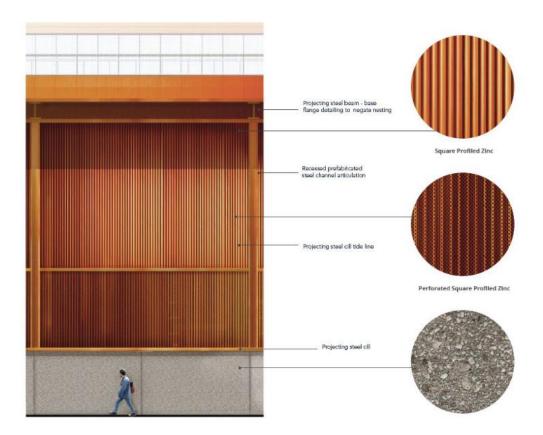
CGI up close imaginary of the proposed material of use on the Maintenance Building and to be used across the site.
